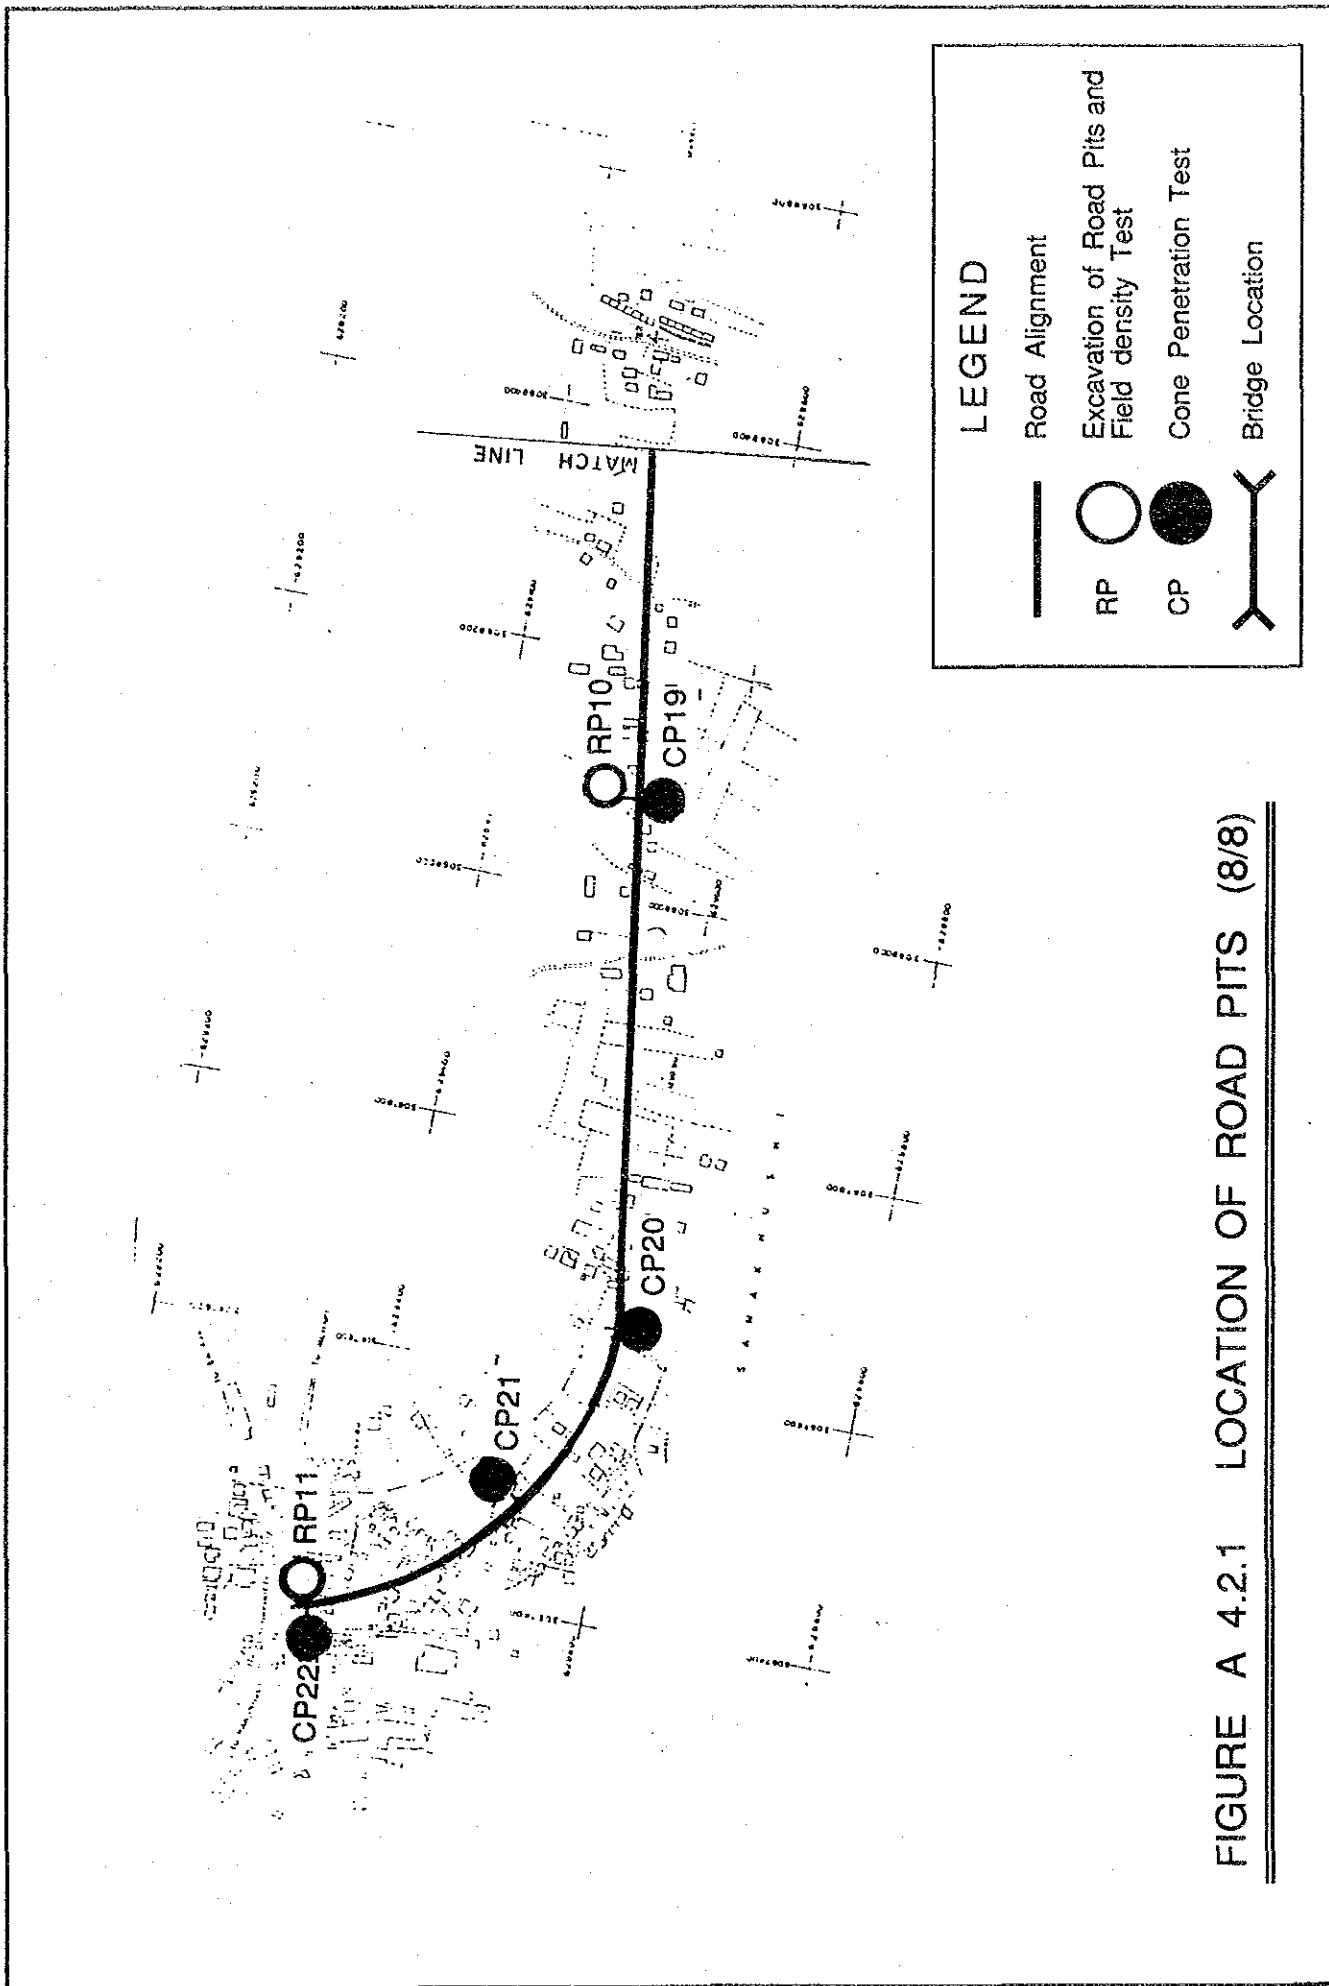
LOCATION OF ROAD PITS (8/8)
